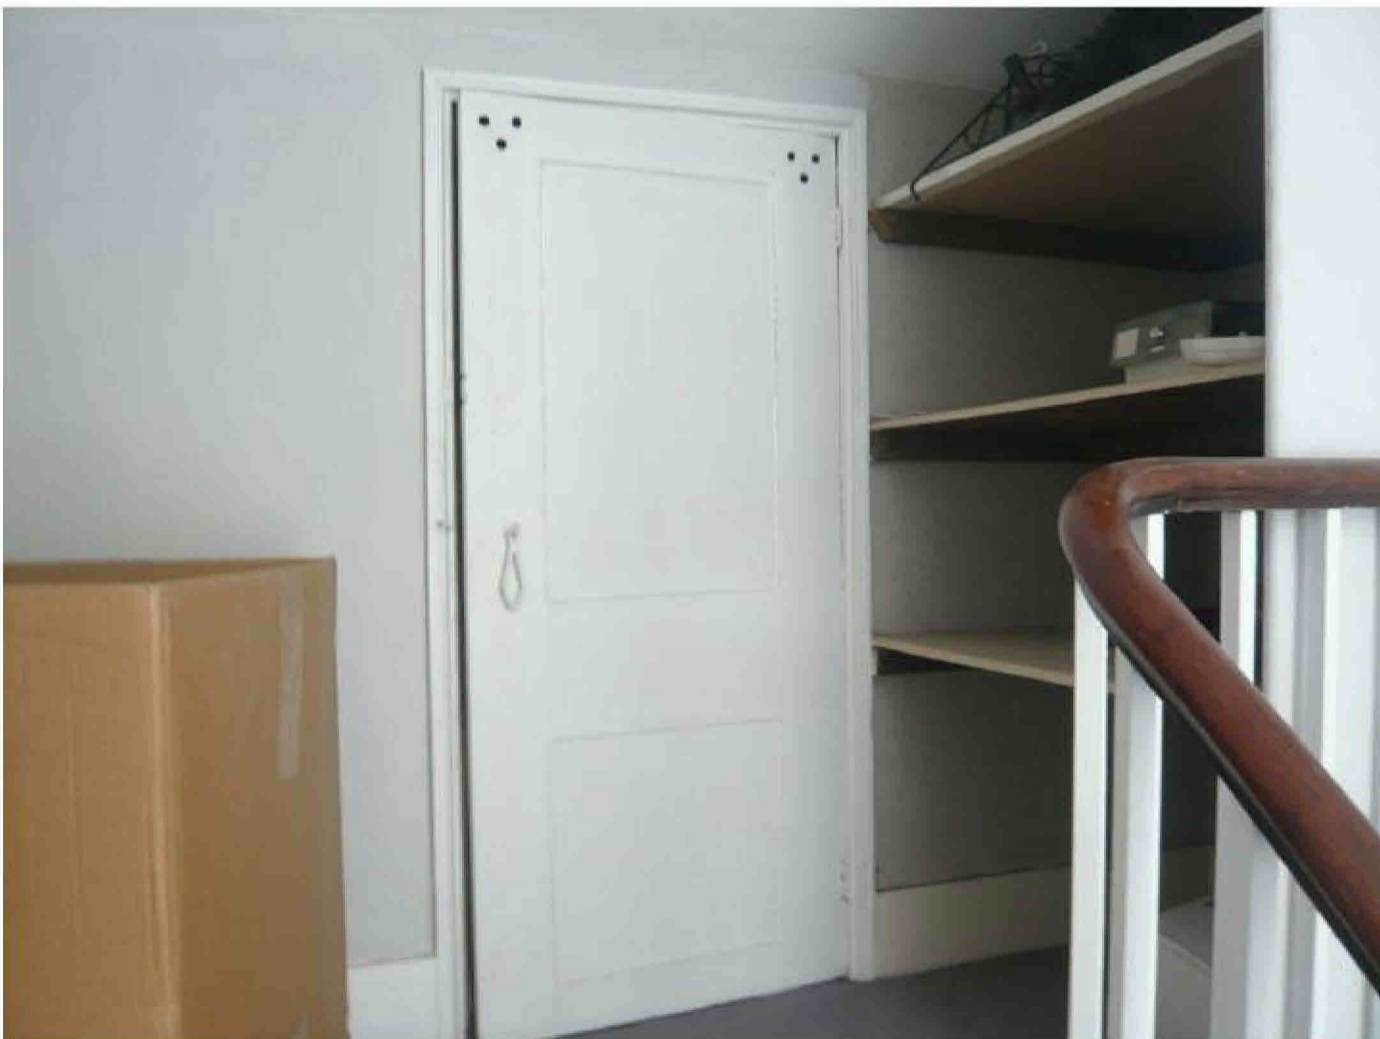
Two-panel door to cupboard on the second floor at the top of the main staircase
